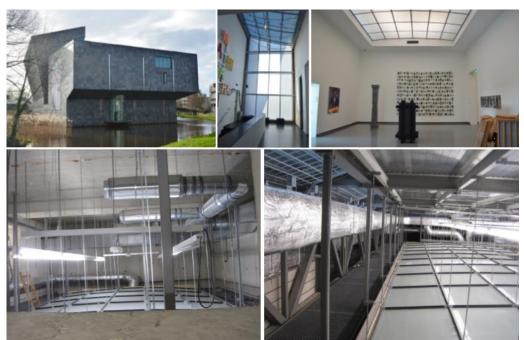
Structure types modern building part B. North and east façade, glass surfaces, interior exhibition room, plenum between floors, plenum below upper roof.
